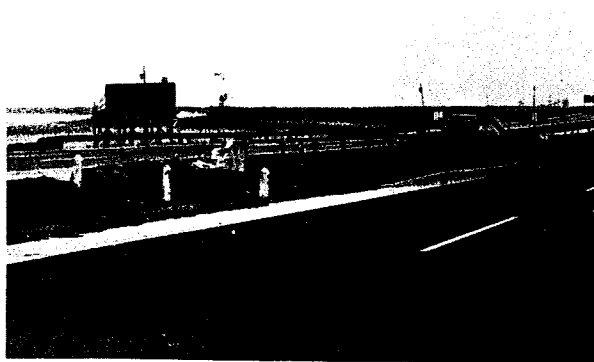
Hazards Associated with Roadway Under Bridge Structure
